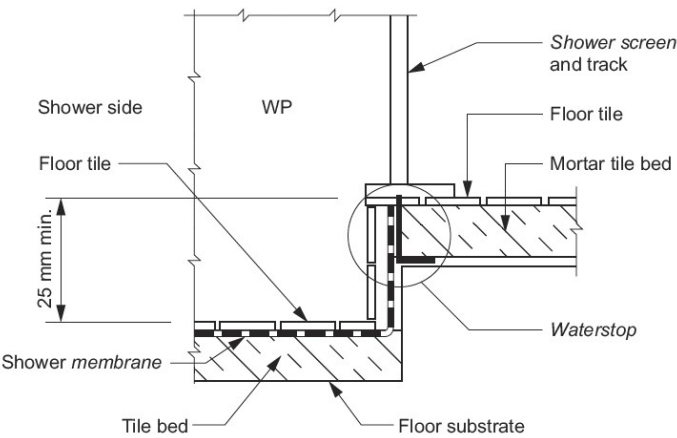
Typical unenclosed stepped down shower construction (membrane below tile bed)
